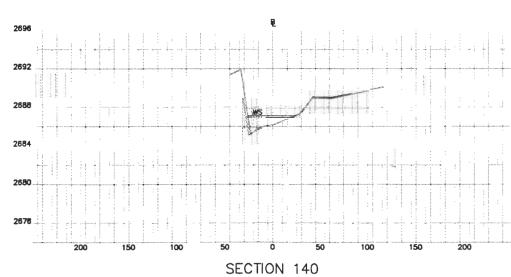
EXISTING CHANNEL LITTLE WEISER RIVER SECTION 1135 & CEMHILL GLADHART LANE BRIDGE SECTION 14
